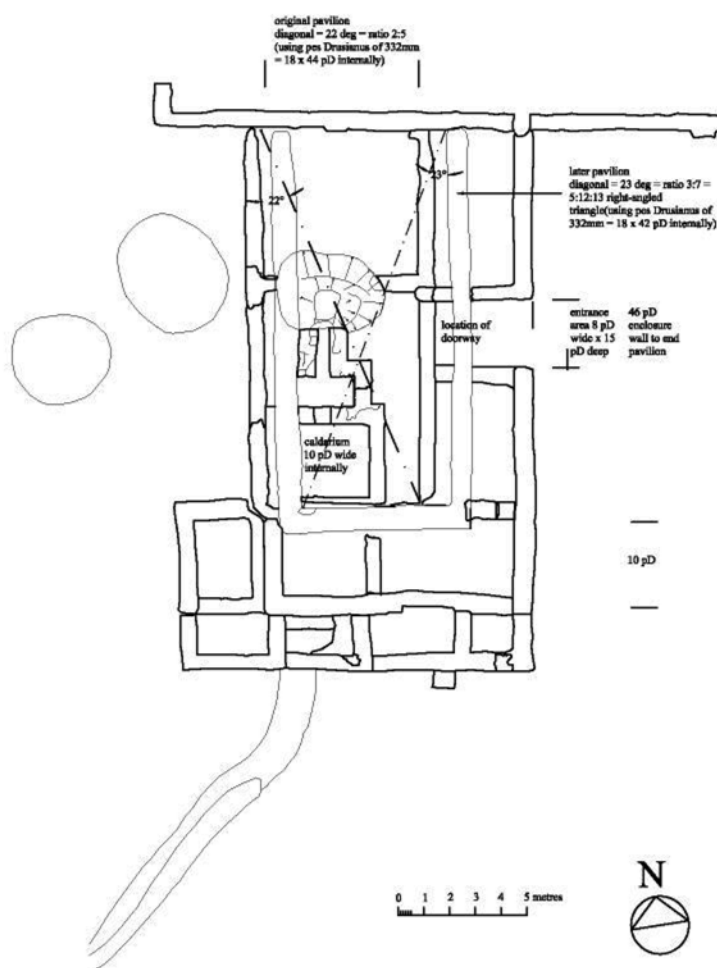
Minster Roman villa – suggested setting out of west pavilion (Building 6).
